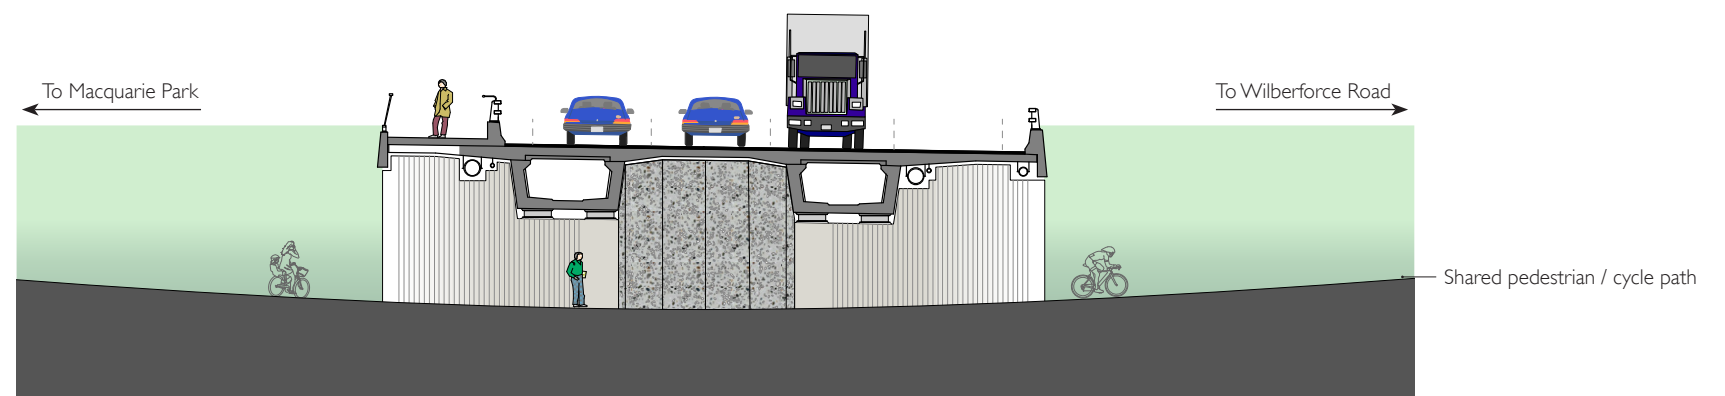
Elevation of northern abutment - facing Wilberforce Road.
